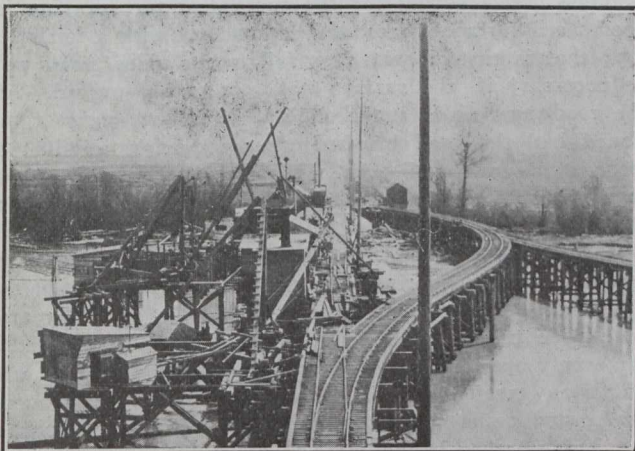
C.P.R. Pitt River Bridge, Showing Trestle and Work on Eastern Portion.
